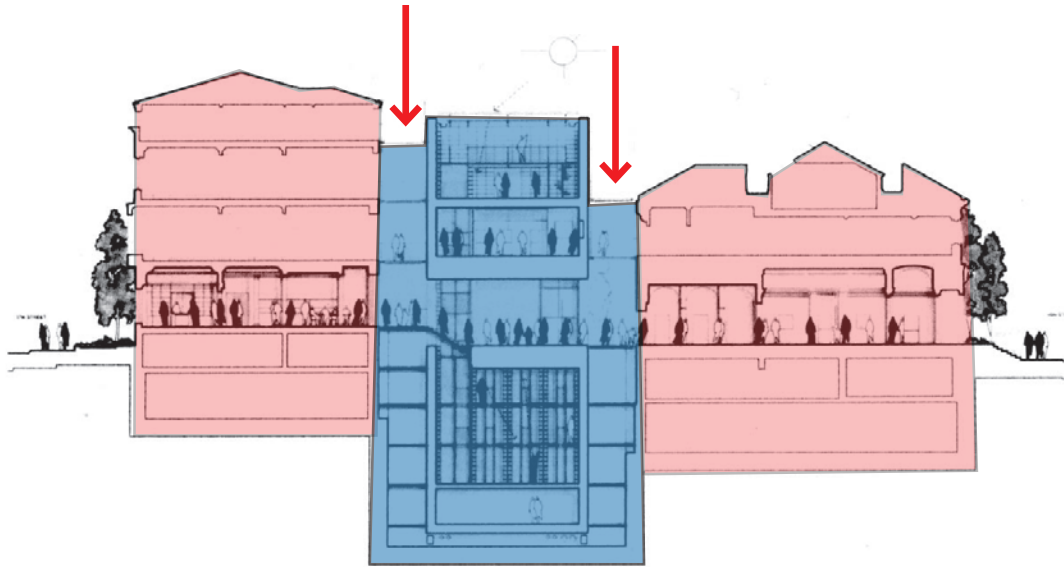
Existing vs. New: As in the plan, the building also steps down in section to create breathing space between the new addition and the existing structures. (Author)
